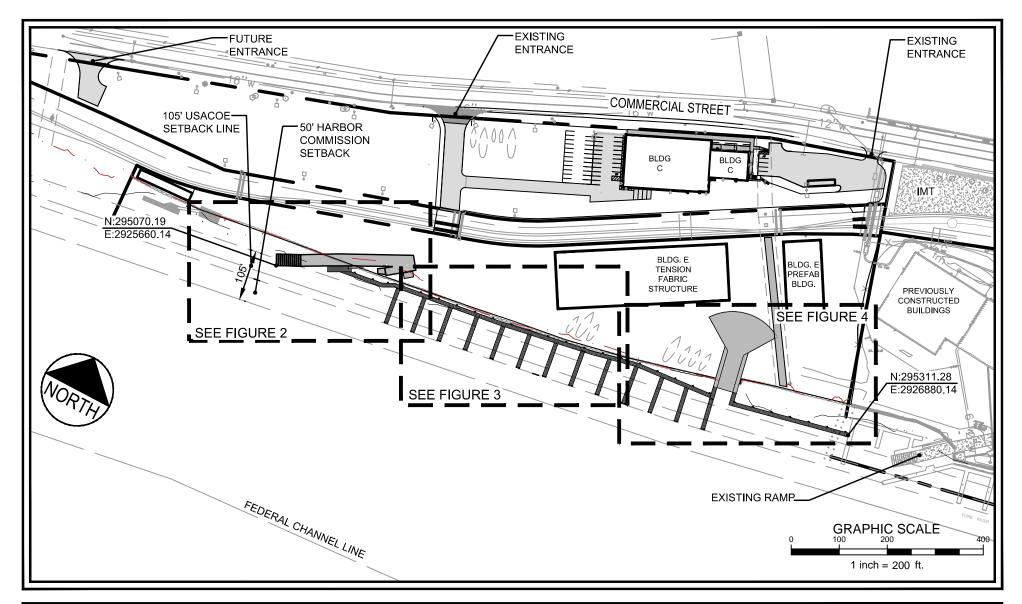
FIGURE:	BOOK: PAGE: 30887 2 32239 148	LOCATION: CITY OF PORTLAND CANAL LANDING	PROPOSED ACTIVITY: SHOREFRONT FACILITIES ASSOCIATED WITH BOATYARD USE	PROJECT APPLICANT: CANAL LANDING LLC 400 WEST COMMERCIAL STREET PORTLAND, ME 04101
